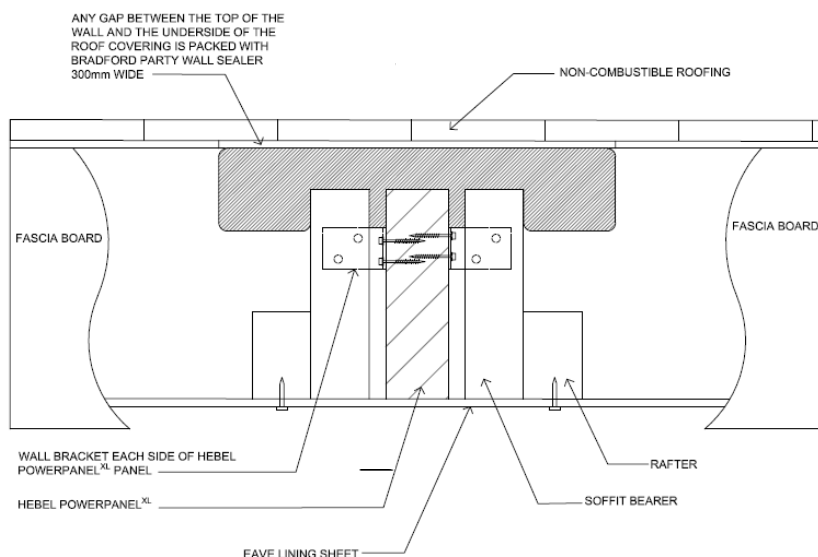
Typical eaves detail using Hebel Powerpanel XL Panel – Section B-B of Figure 18
